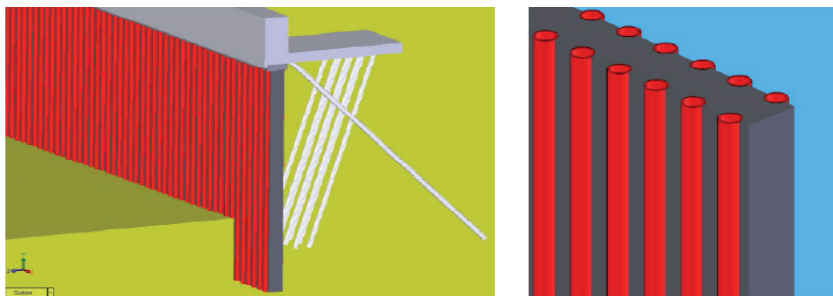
Hybrid wall structure consisting of two rows of pipe piles with concrete between.
